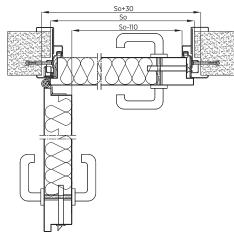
Installation of the ECO Tech single-leaf seamless door with a wrap-around frame without a thermal break to a masonry wall – horizontal cross-section
